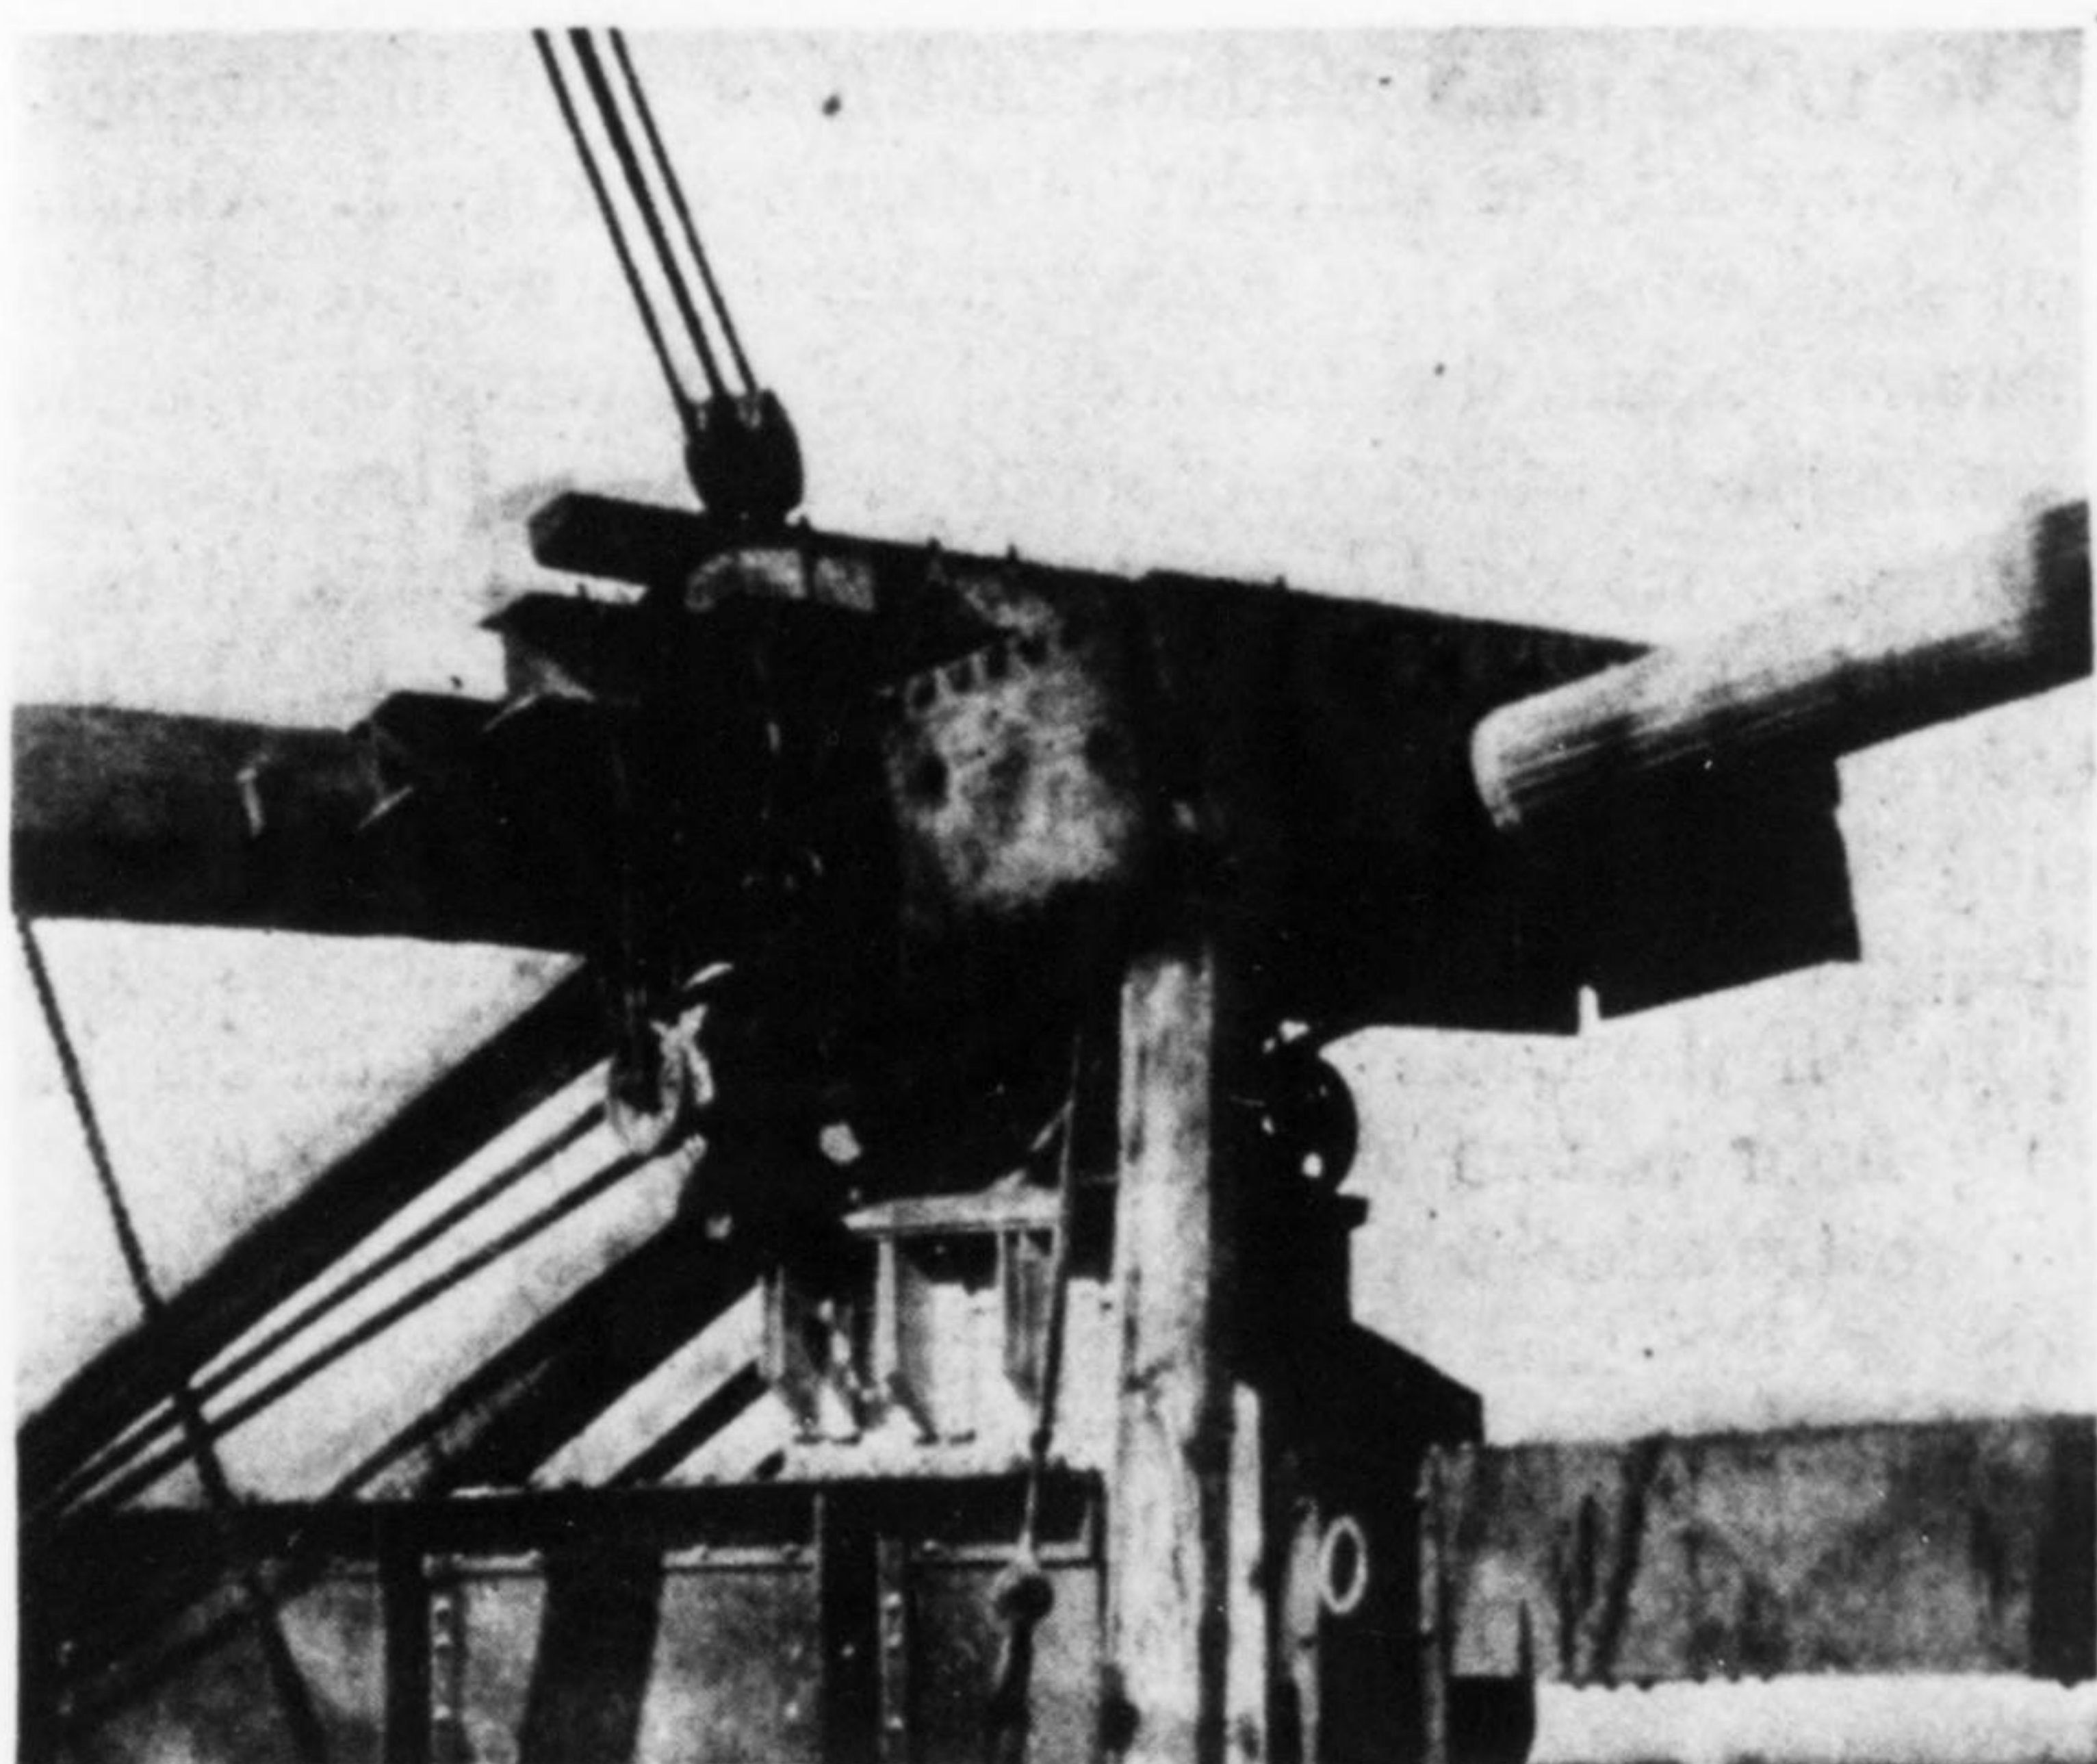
HOLDBACK YOKE IN FRONT OF CABLE-BENT SADDLE, MOUNT HOPE
